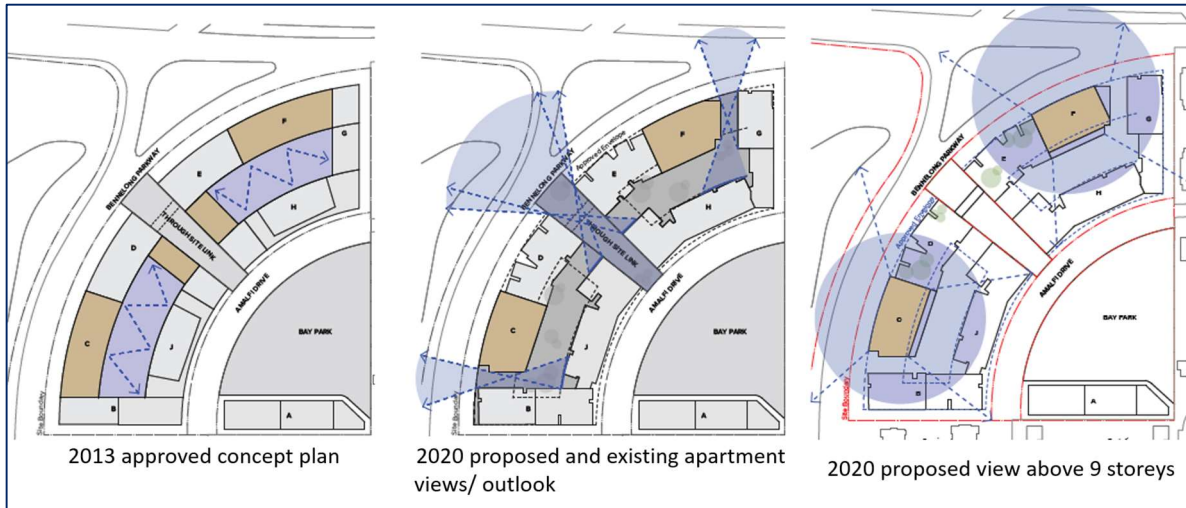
| Views and outlook from existing and proposed apartments (Source: FRtS Urban Design Report)
